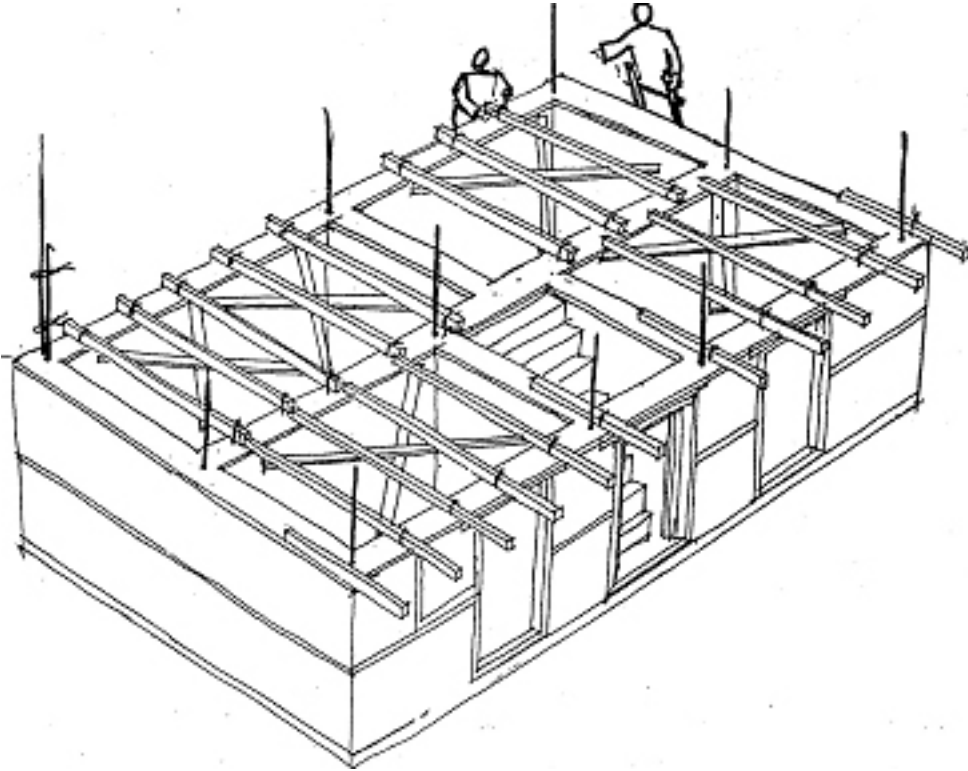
B: Seismic Strengthening - Floor Horizontal Bracing and Vertical Reinforcement Bars
